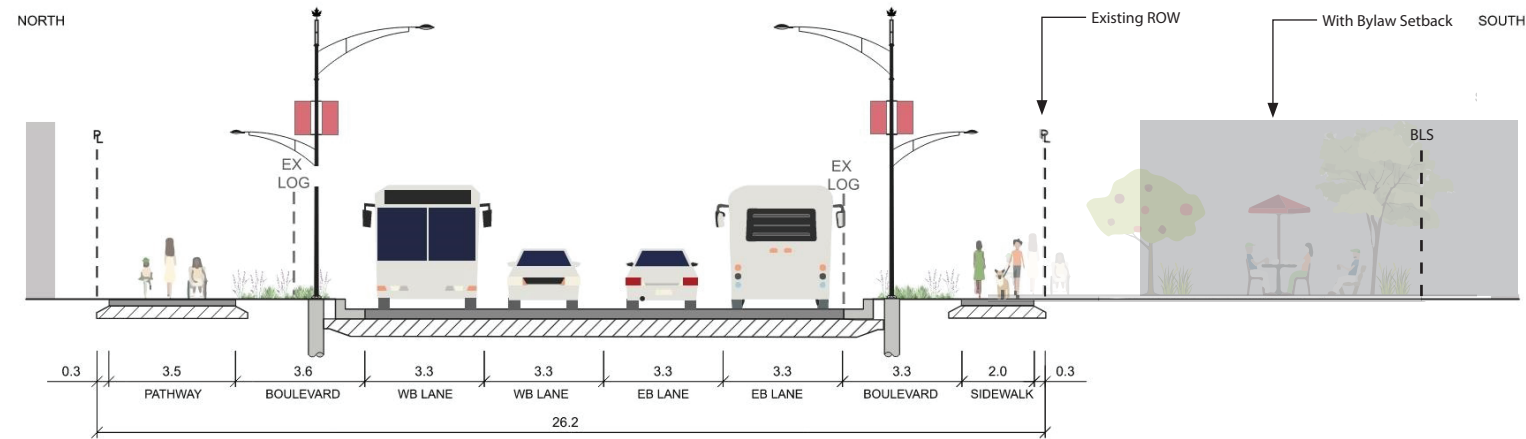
POSSIBLE DESIGN PATHS FOR 16 AVENUE NW CROSS SECTION
